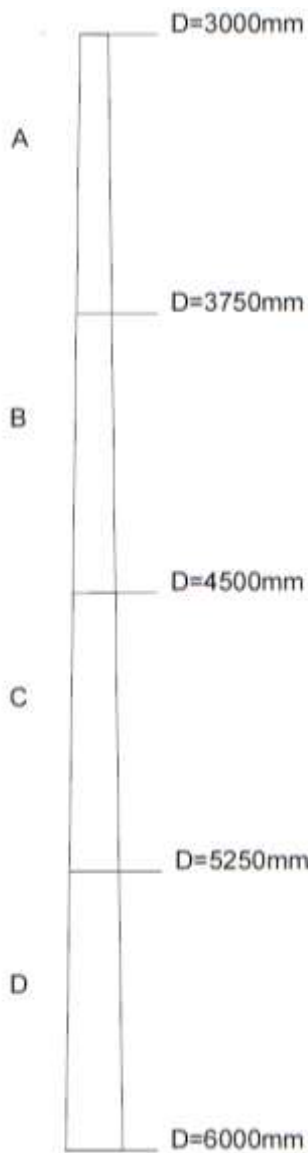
Tower view with indicated the top and bottom diameters of the four extruded parts
